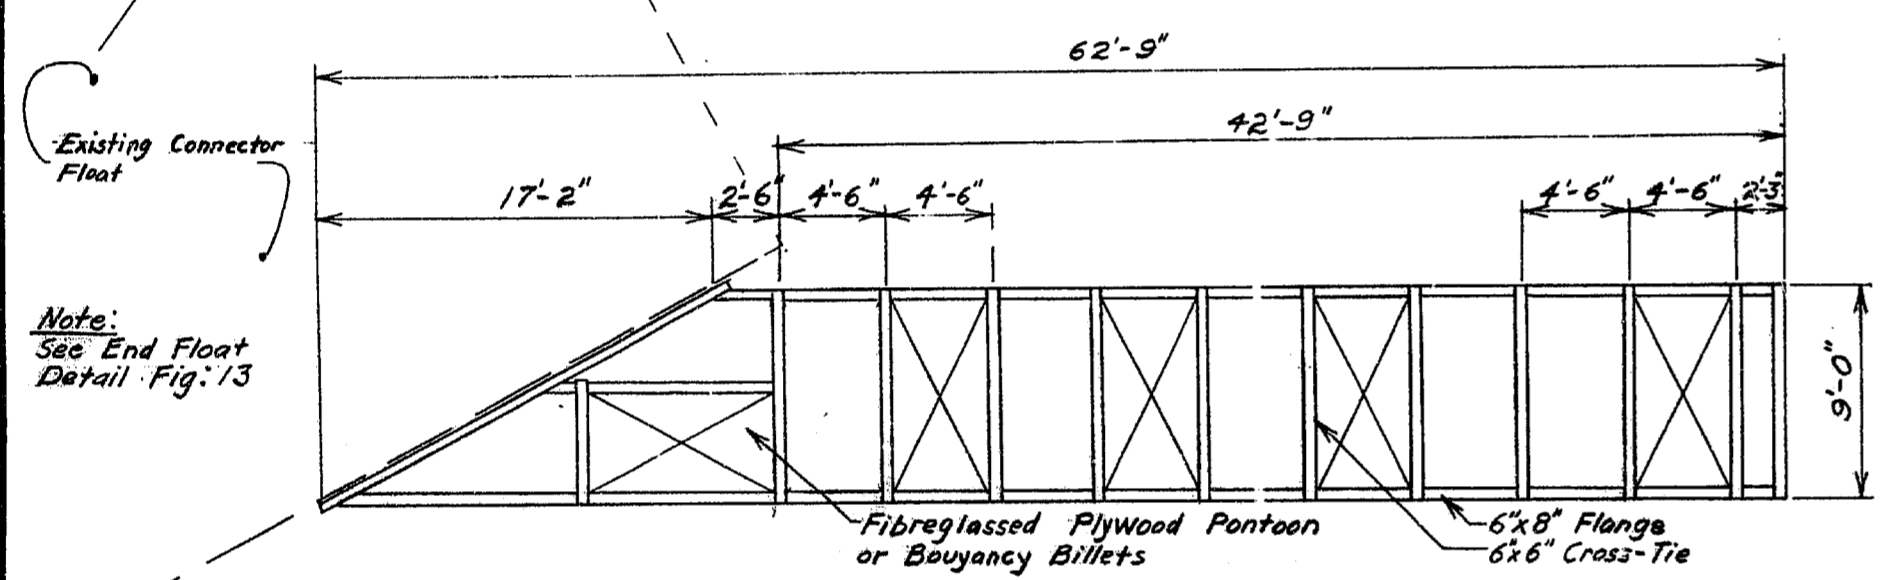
PLAN SHOWING SUPERSTRUCTURE FLOAT "C" Scale: 1/8"=1'-0"
